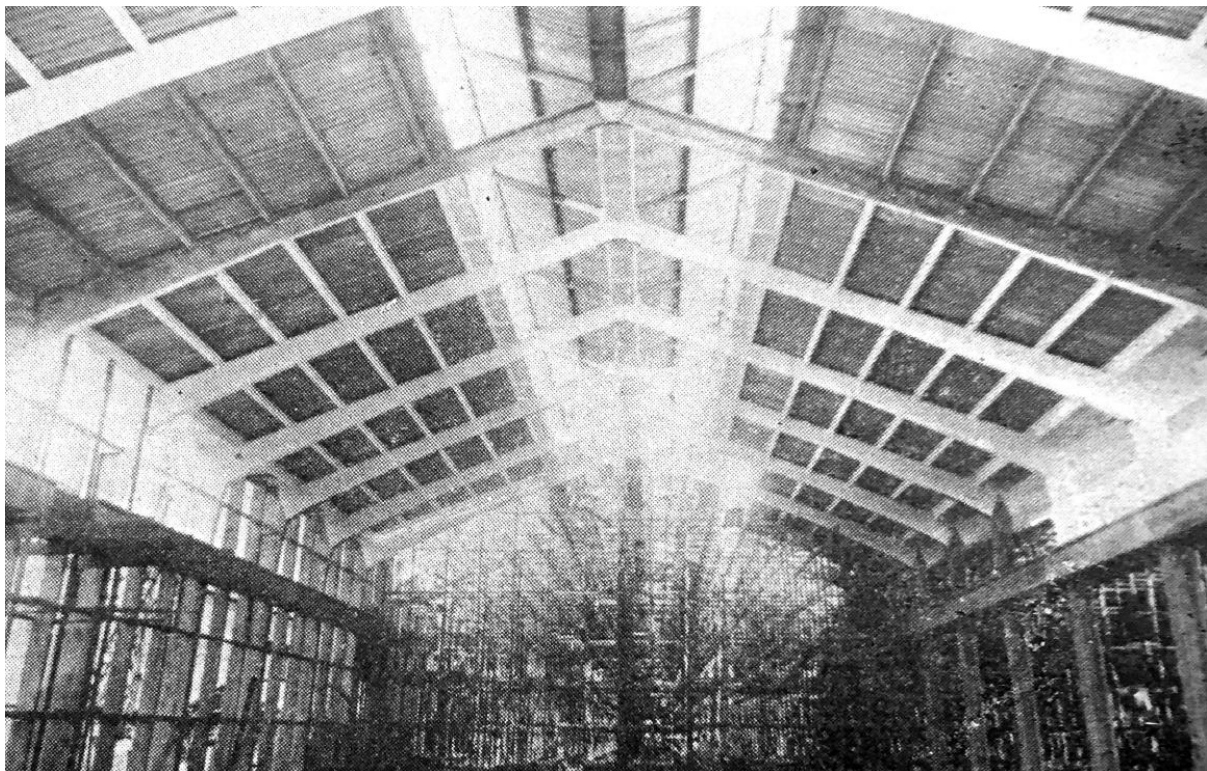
Eighty-one foot span "technical building". It is on this type of building that the Brazilian engineer has done his best work. This building is 610 ft. long, without expansion joints.
